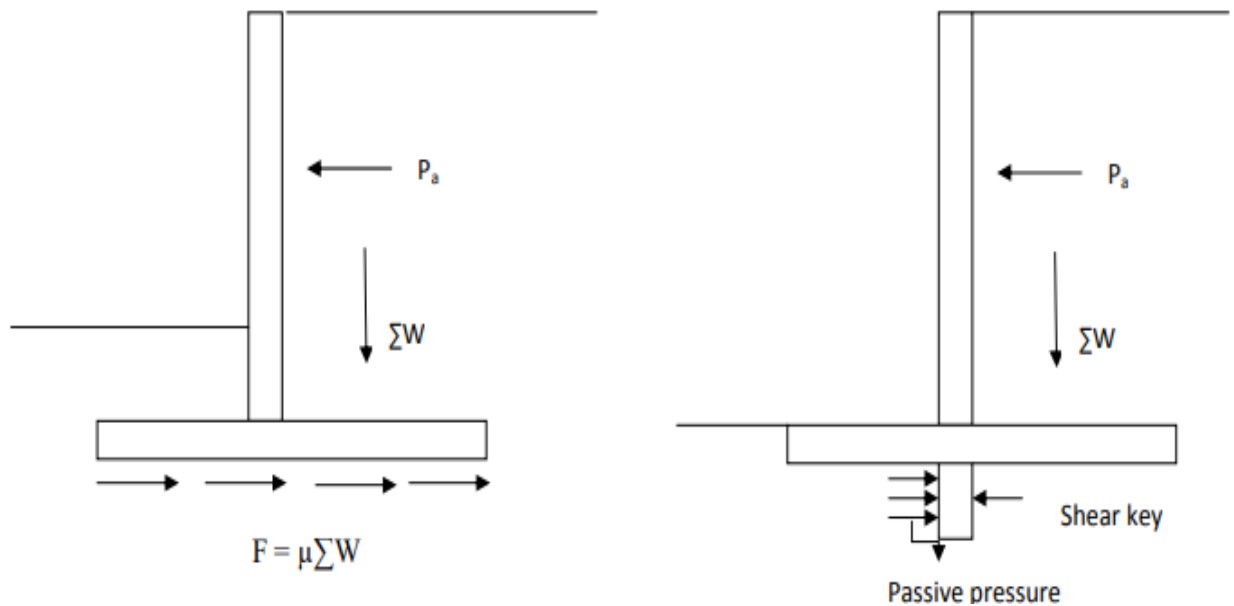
Sliding of Cantilever Retaining Wall without Shear Key and with Shear Key
